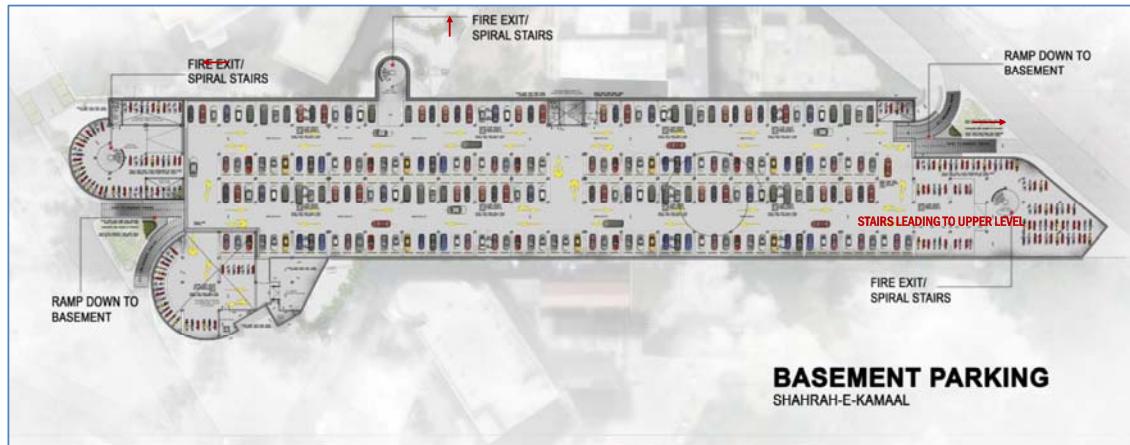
Typical Floor Plan – Basement Parking for Shahrah-e-Kamal Development (Level 1 and Level 2)⁵
